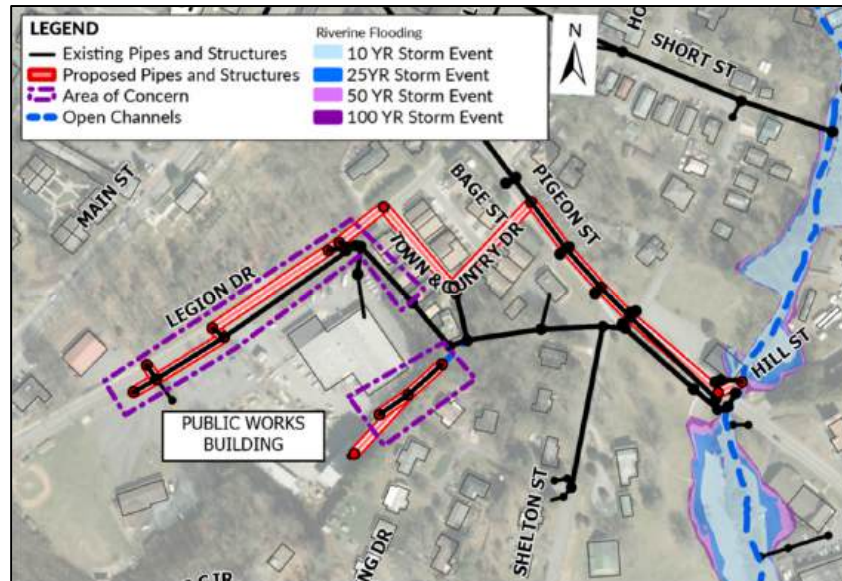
Concept Project Area 1 – Waynesville Public Works and Legion Drive
